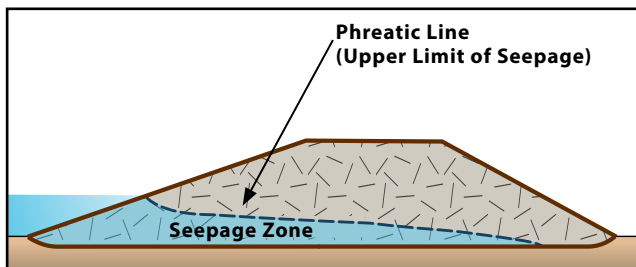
Typical Embankment Section Showing Phreatic Line Contained within Fill Section
